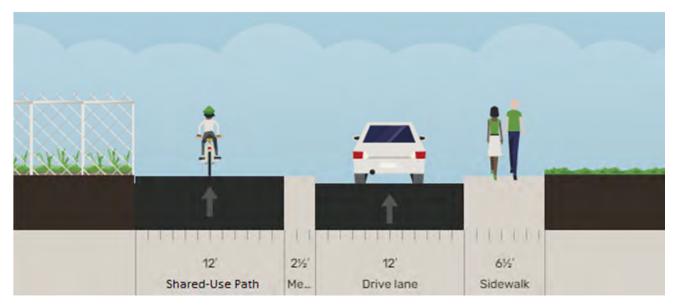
S Sprague Way Proposed Cross Section, South of Crossing (dimensions are approximate)
